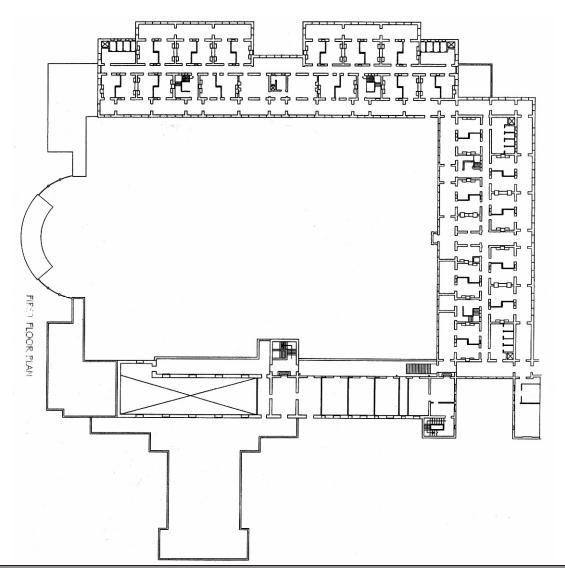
(h): Layout plan of MH Hostel Old Block: First Floor
